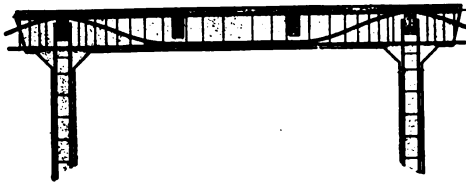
Column and Floor Construction, Reinforced Cement Construction Co.'s System.
